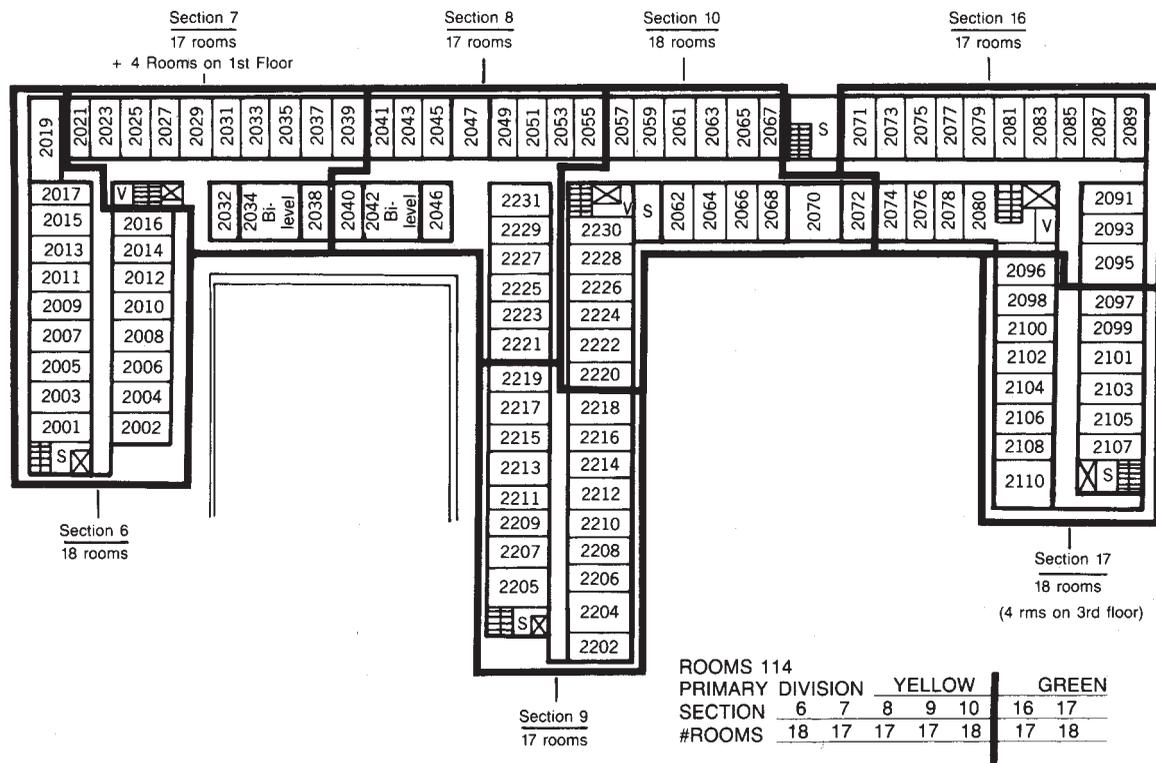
House Breakout Plan of the model hotel; second floor.
